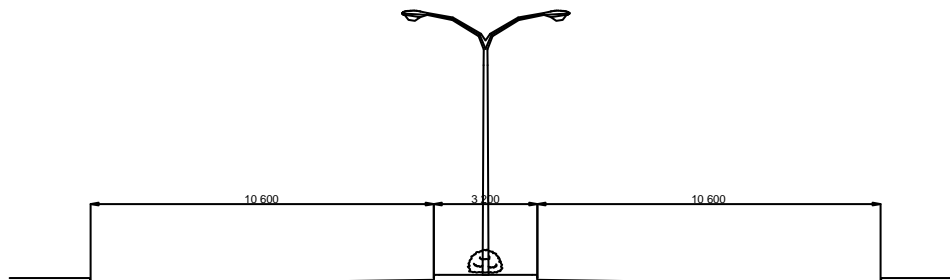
(2) Existing Cross Section at Malema Town
